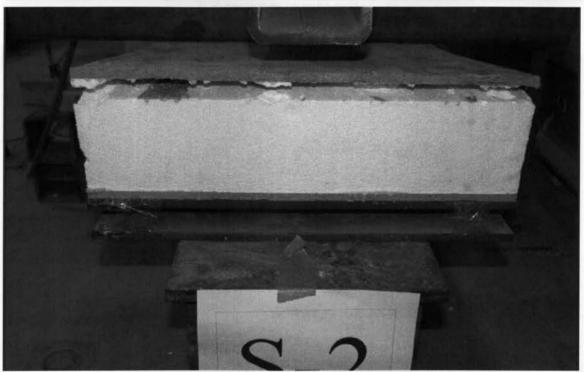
Close-up view of foam-OSB splitting over the support of specimen S-2 at failure
